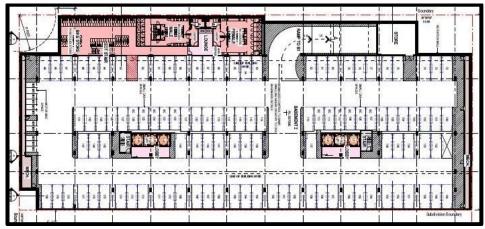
Office basement carparking level 2 (source: May Russell Architects 2022)
